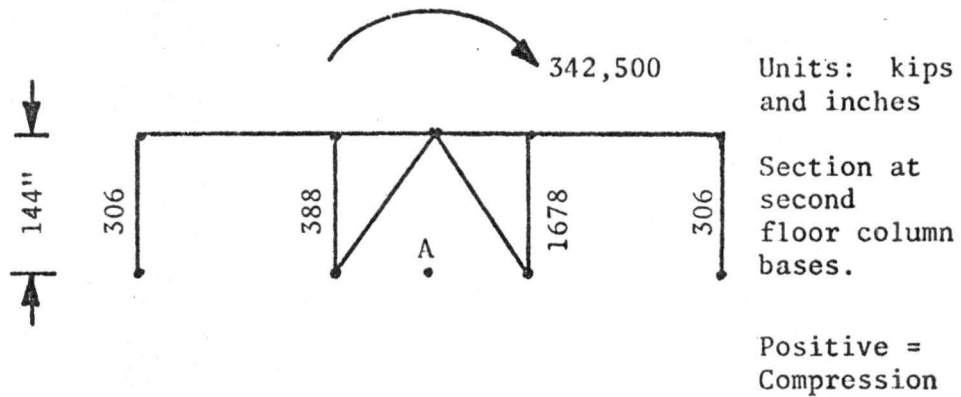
Column axial load distributions in the K braced vertical truss, 3/4 (W+G) loading.
